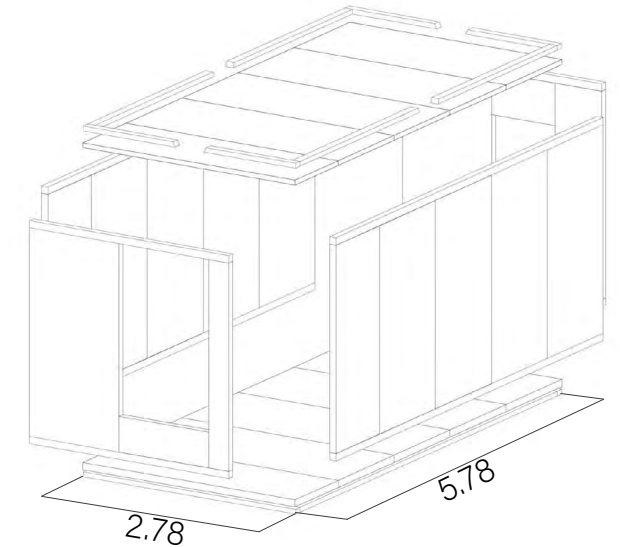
Modules Dimensions, Gundelfinger Straße Hostel
